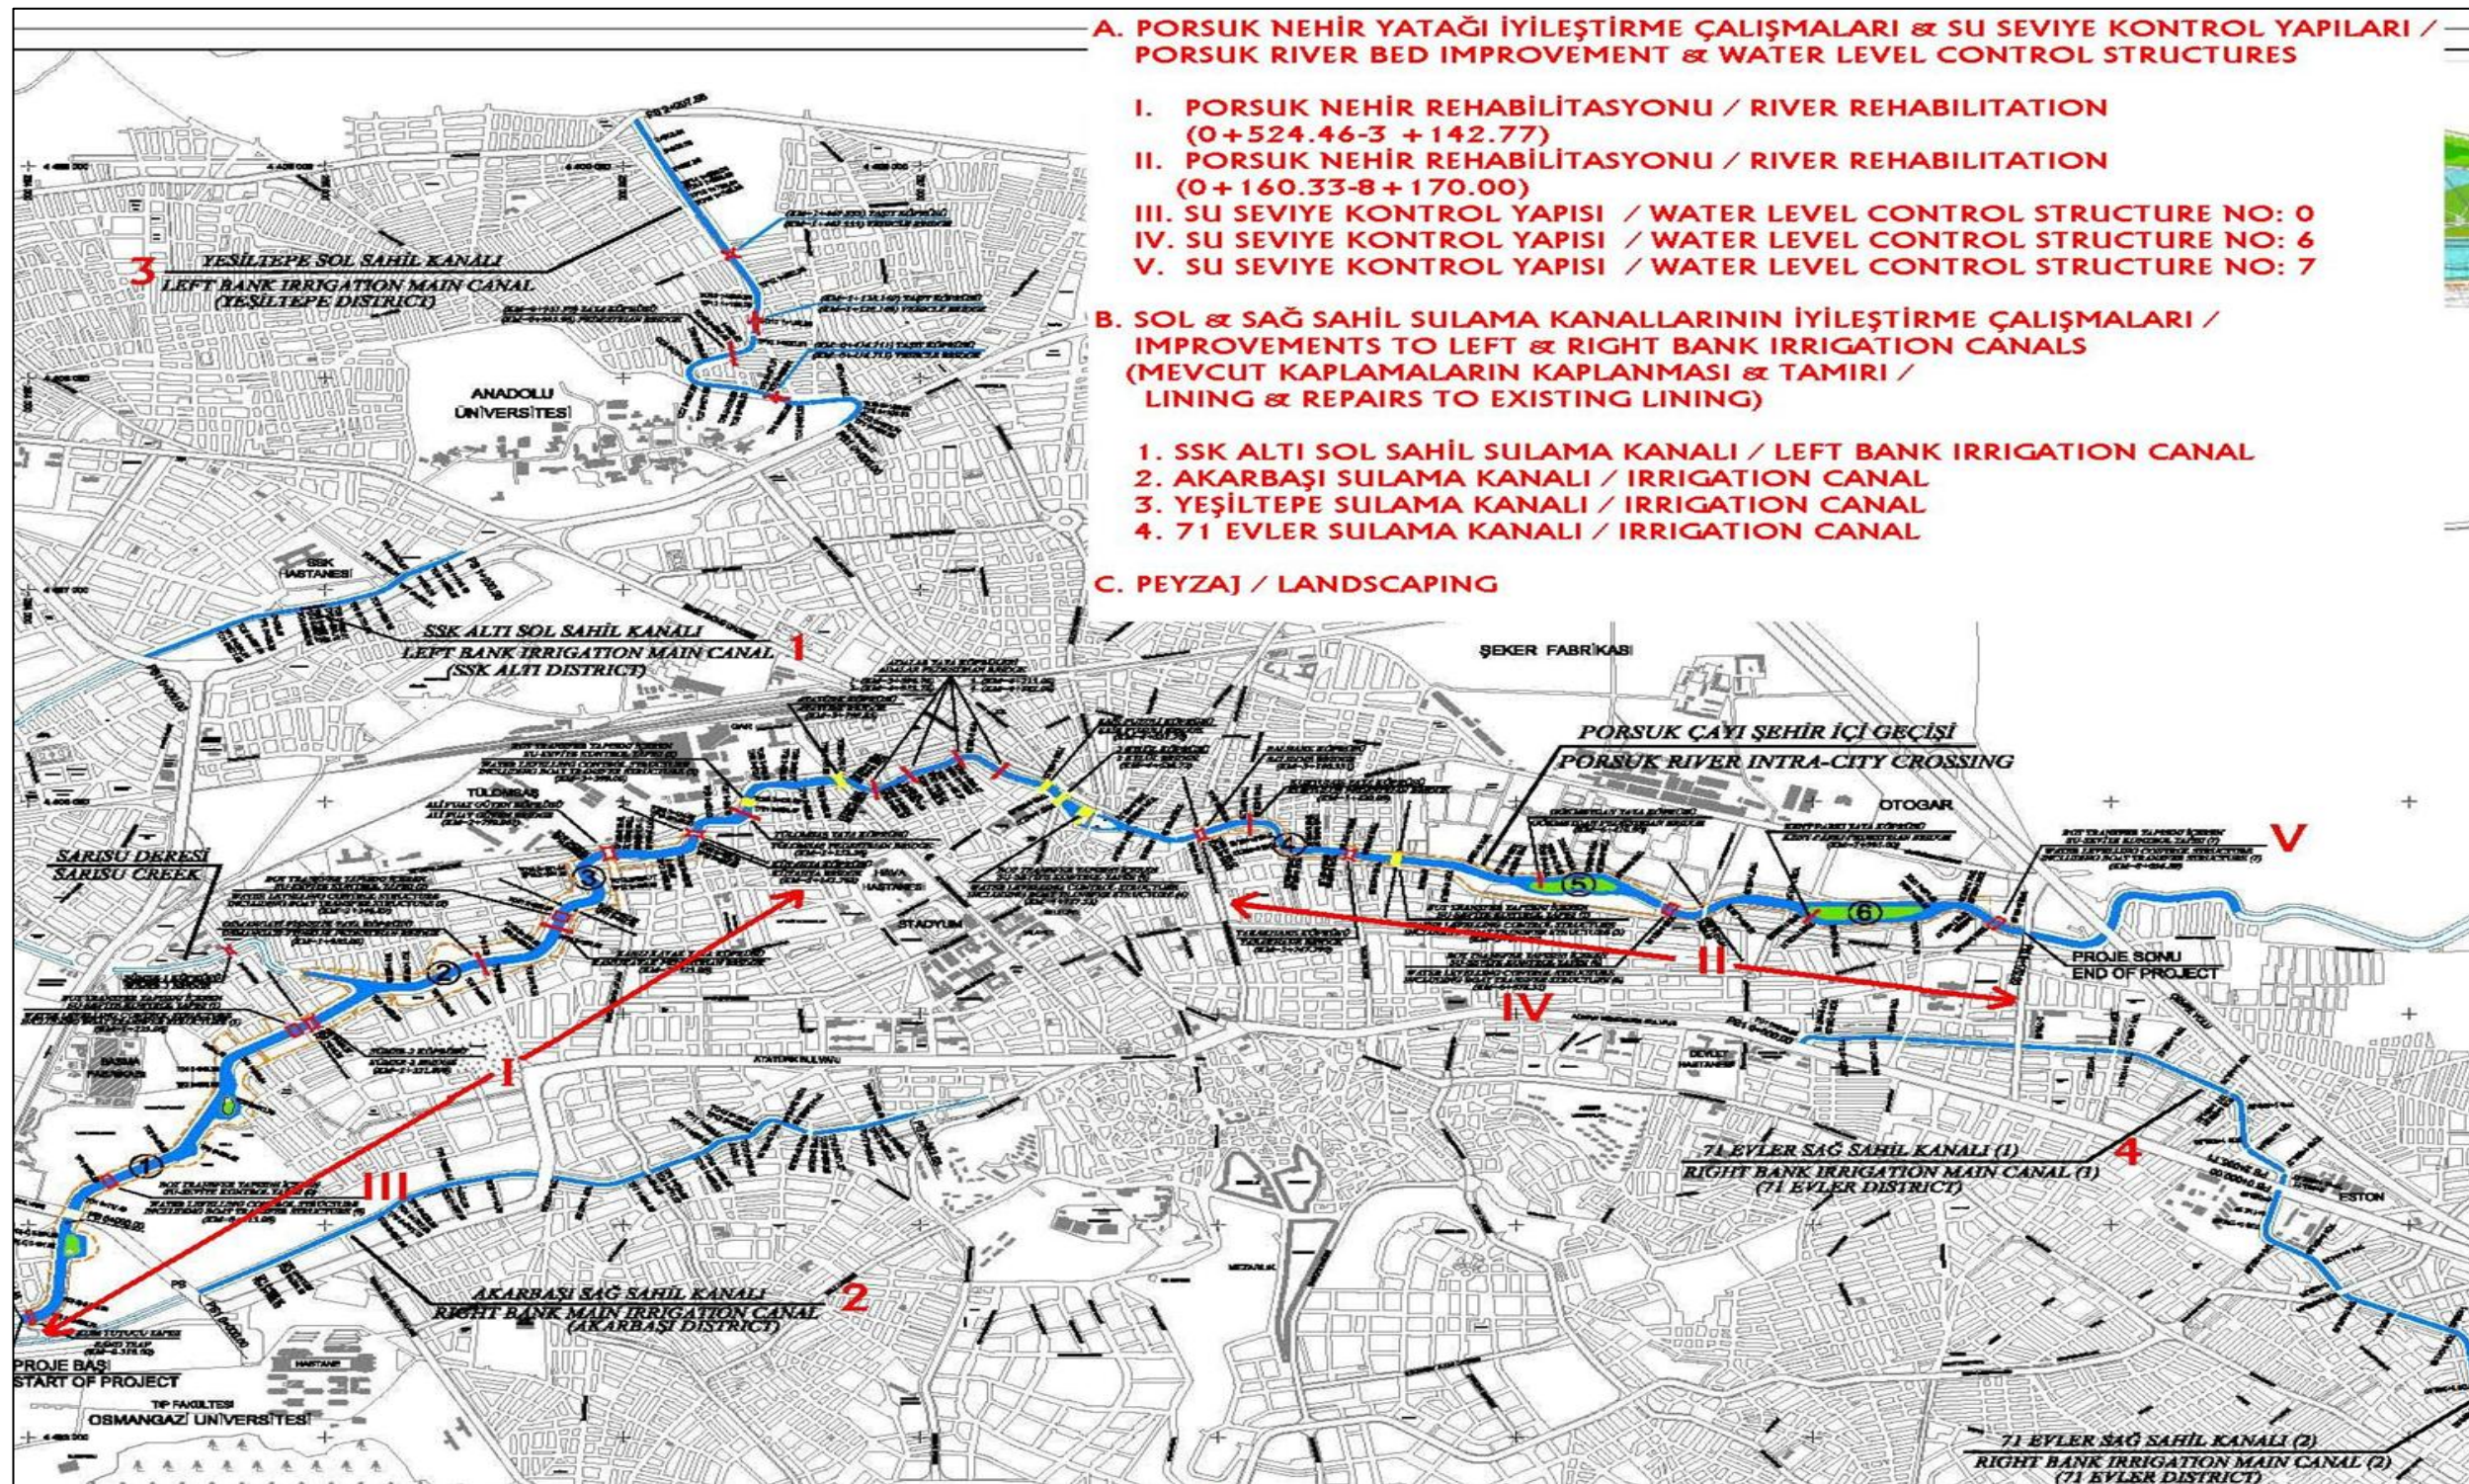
Layout Plan that Shows Porsuk River Bed Improvement, Improvements to Bank Irrigation Canals and Landscaping
